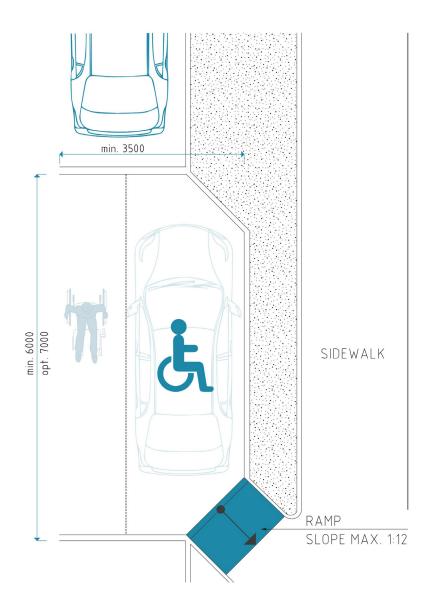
Parking space dimensions in longitudinal parking layout (Čerešňová, Suláková)
